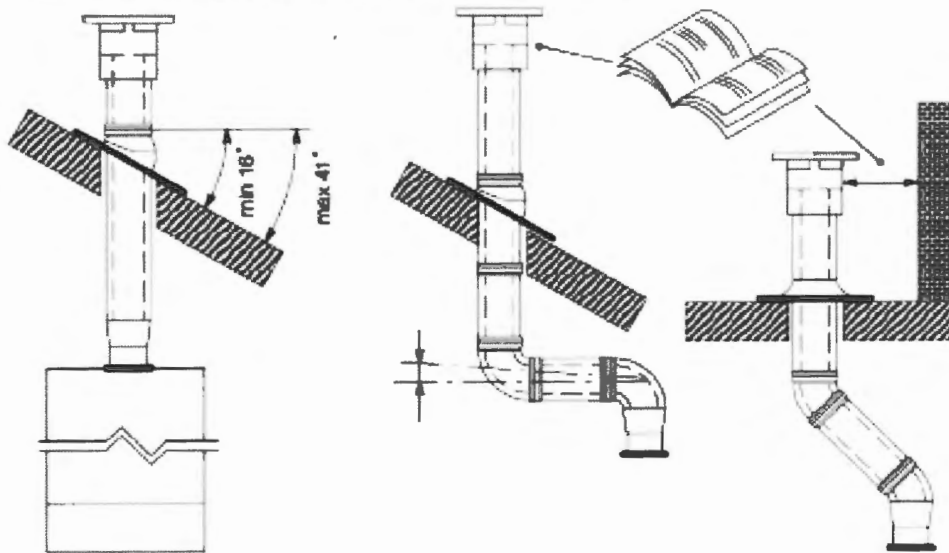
(vertical pipe ϕ 3.1 / ϕ 4.9 in)
